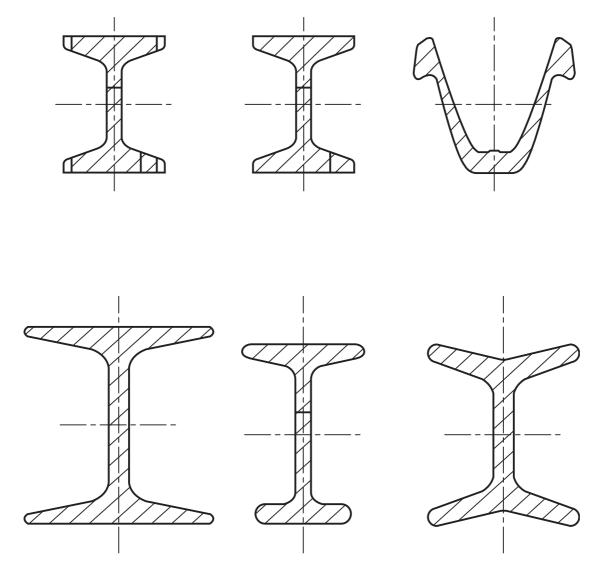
Illustration of typical mining frame sections (see 3.4.7.3)
